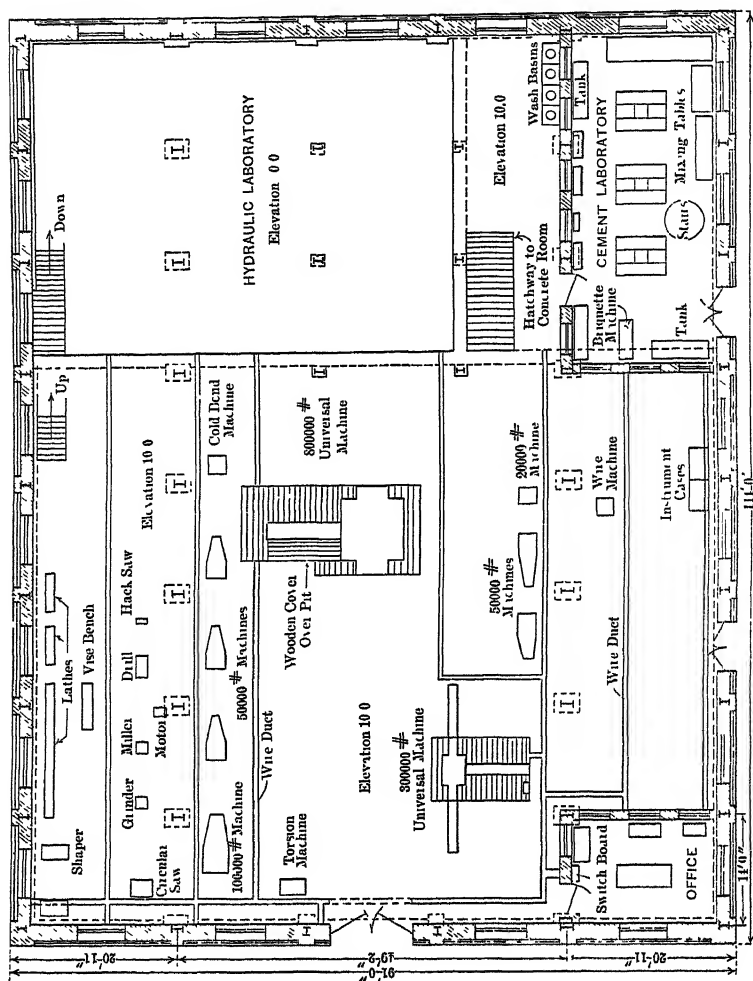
FLOOR-PLAN OF FRITZ ENGINEERING LABORATORY.
